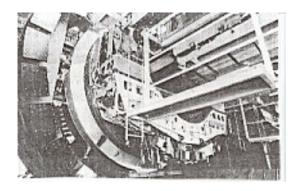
Automated tunnel construction system (courtesy: Kawasaki Heavy Industries)
